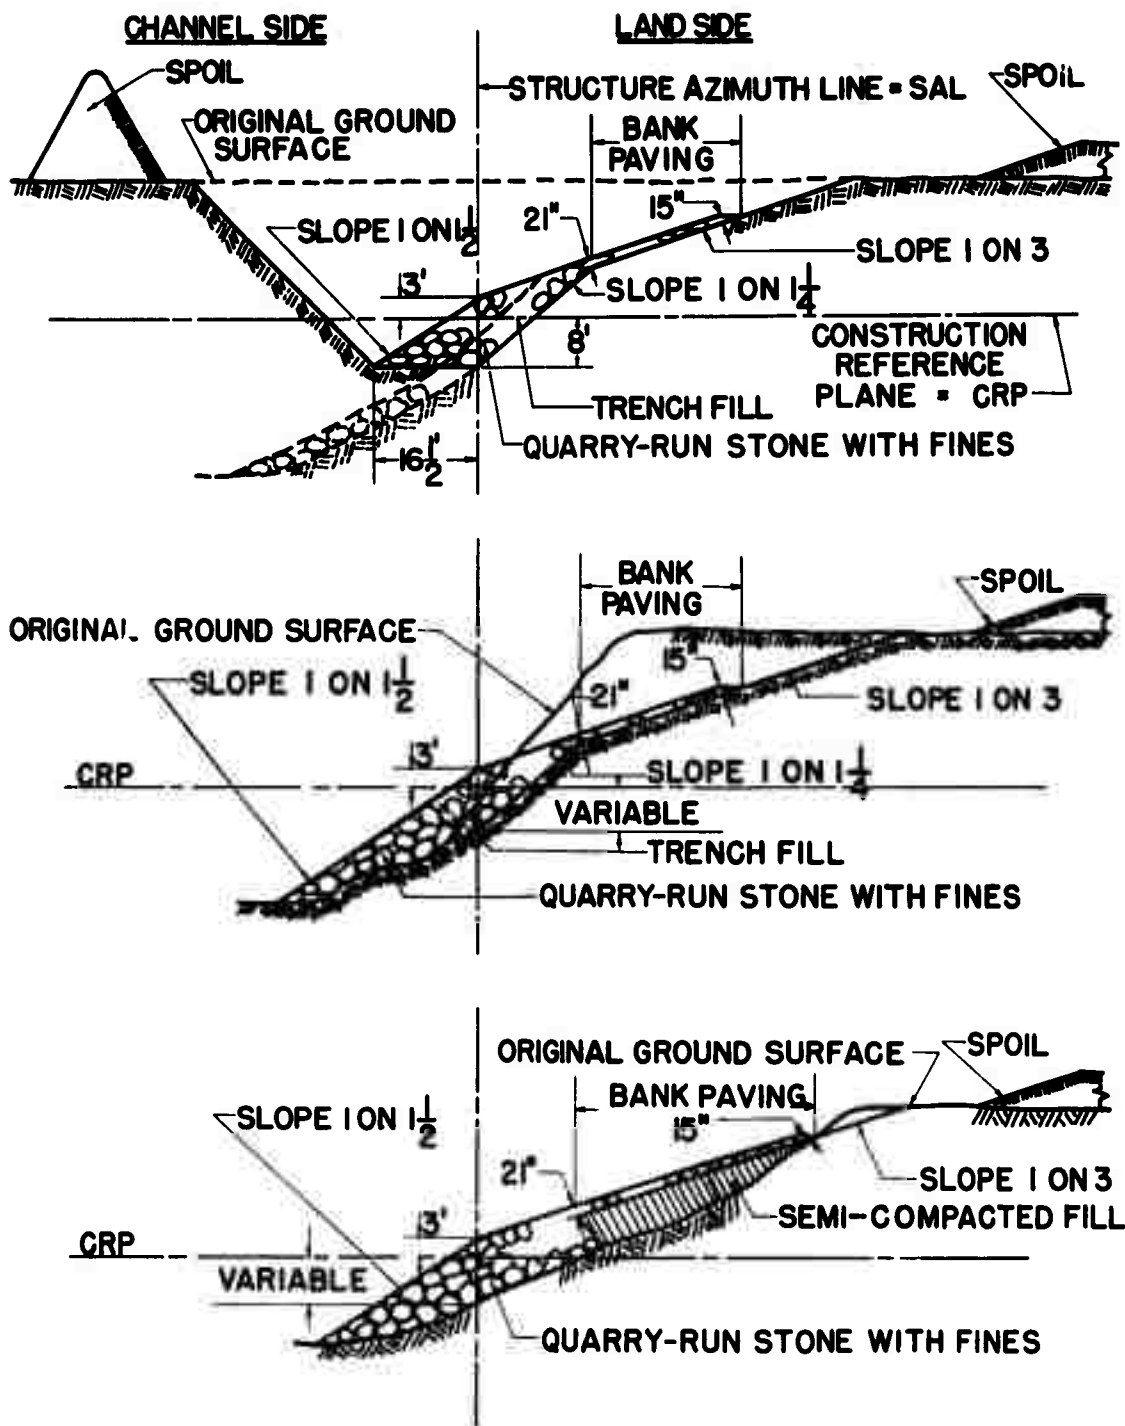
Typical sections for standard revetment without mattress (trench fill), Arkansas River bank stabilization
